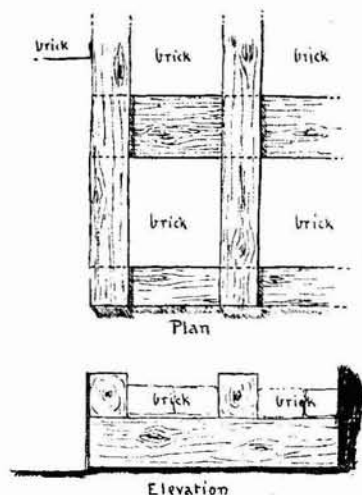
Timber construction in brick pillar: Maru-Aten I. Scale $\frac{1}{16}$.
